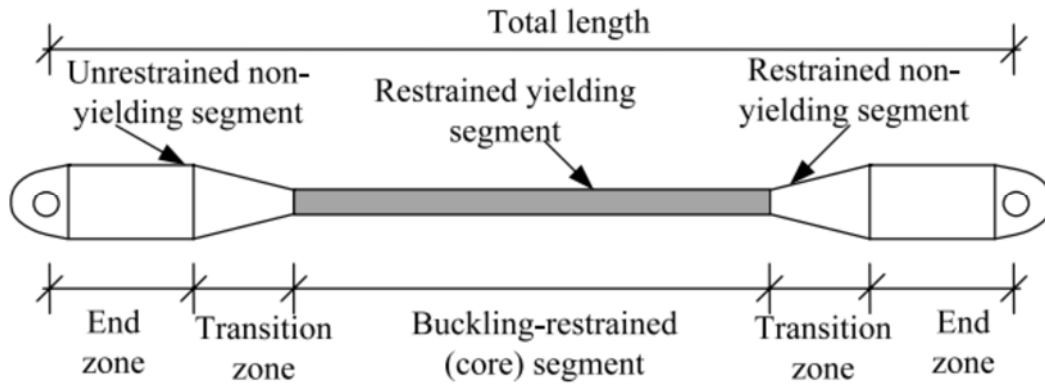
Typical section of a BRB (Sahoo and Chao, 2010)
